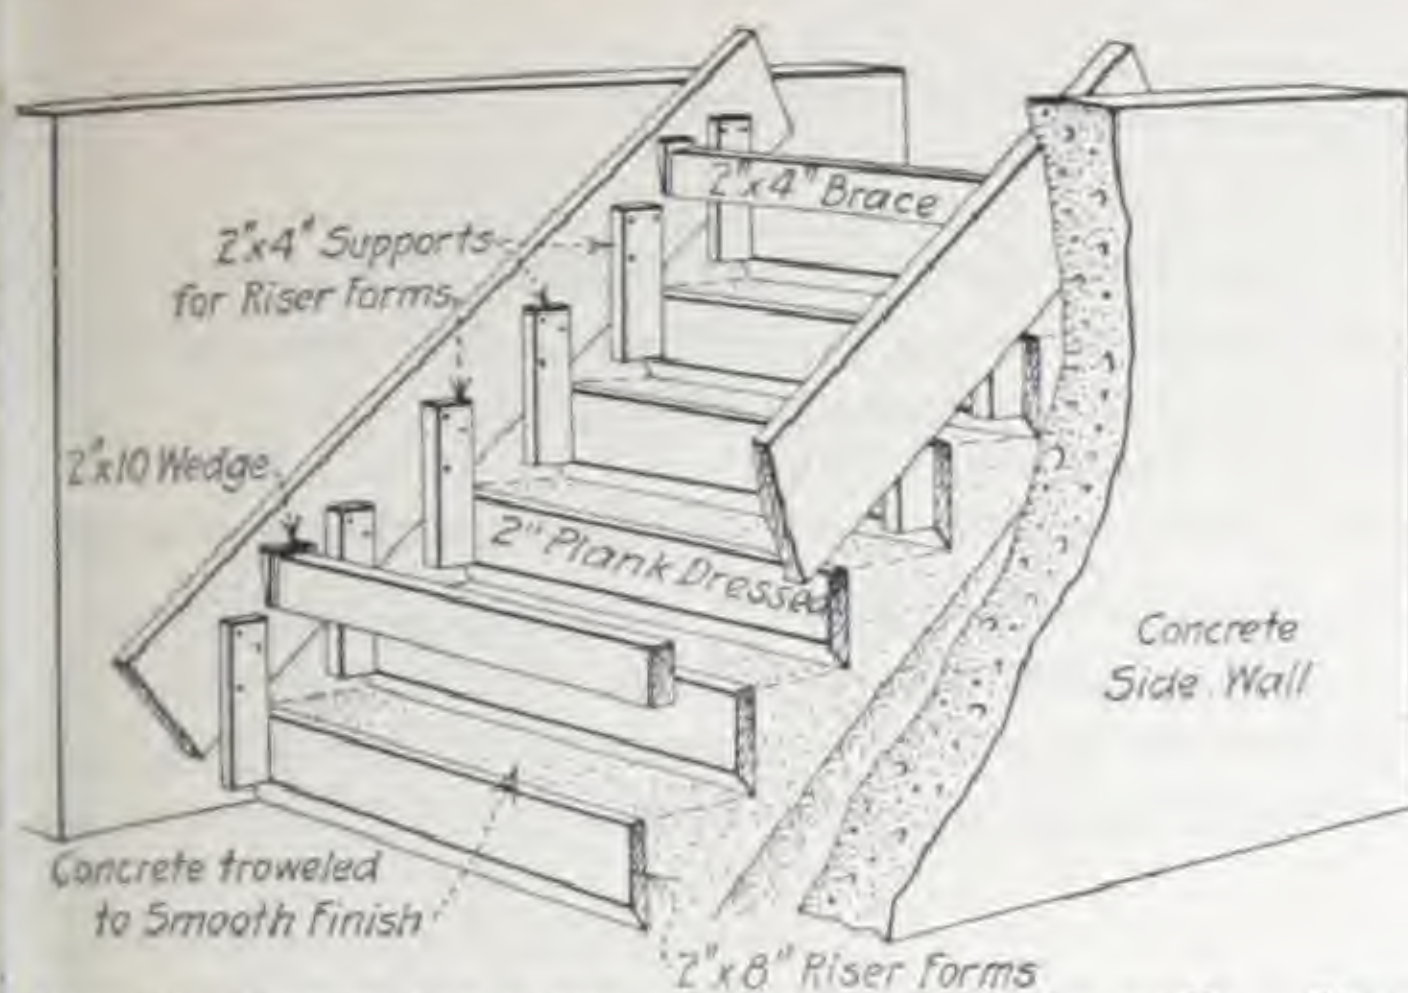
Forms for steps with concrete side walls. Step slab resting on the ground.
